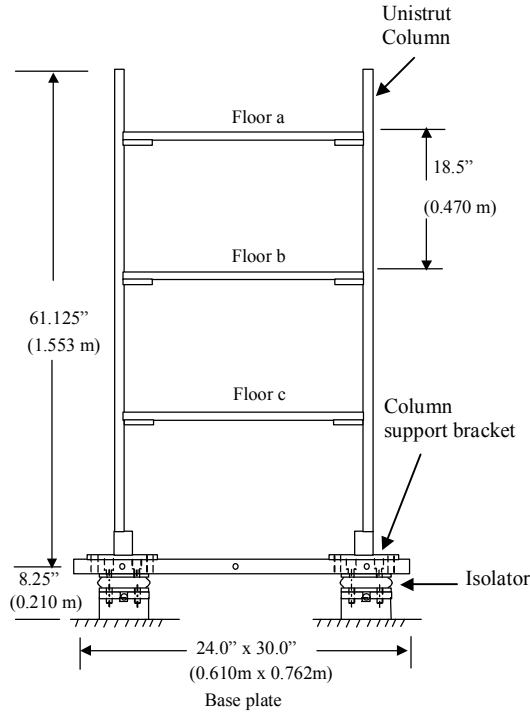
Assembled frame structure, out of plane shaking (not to scale).
